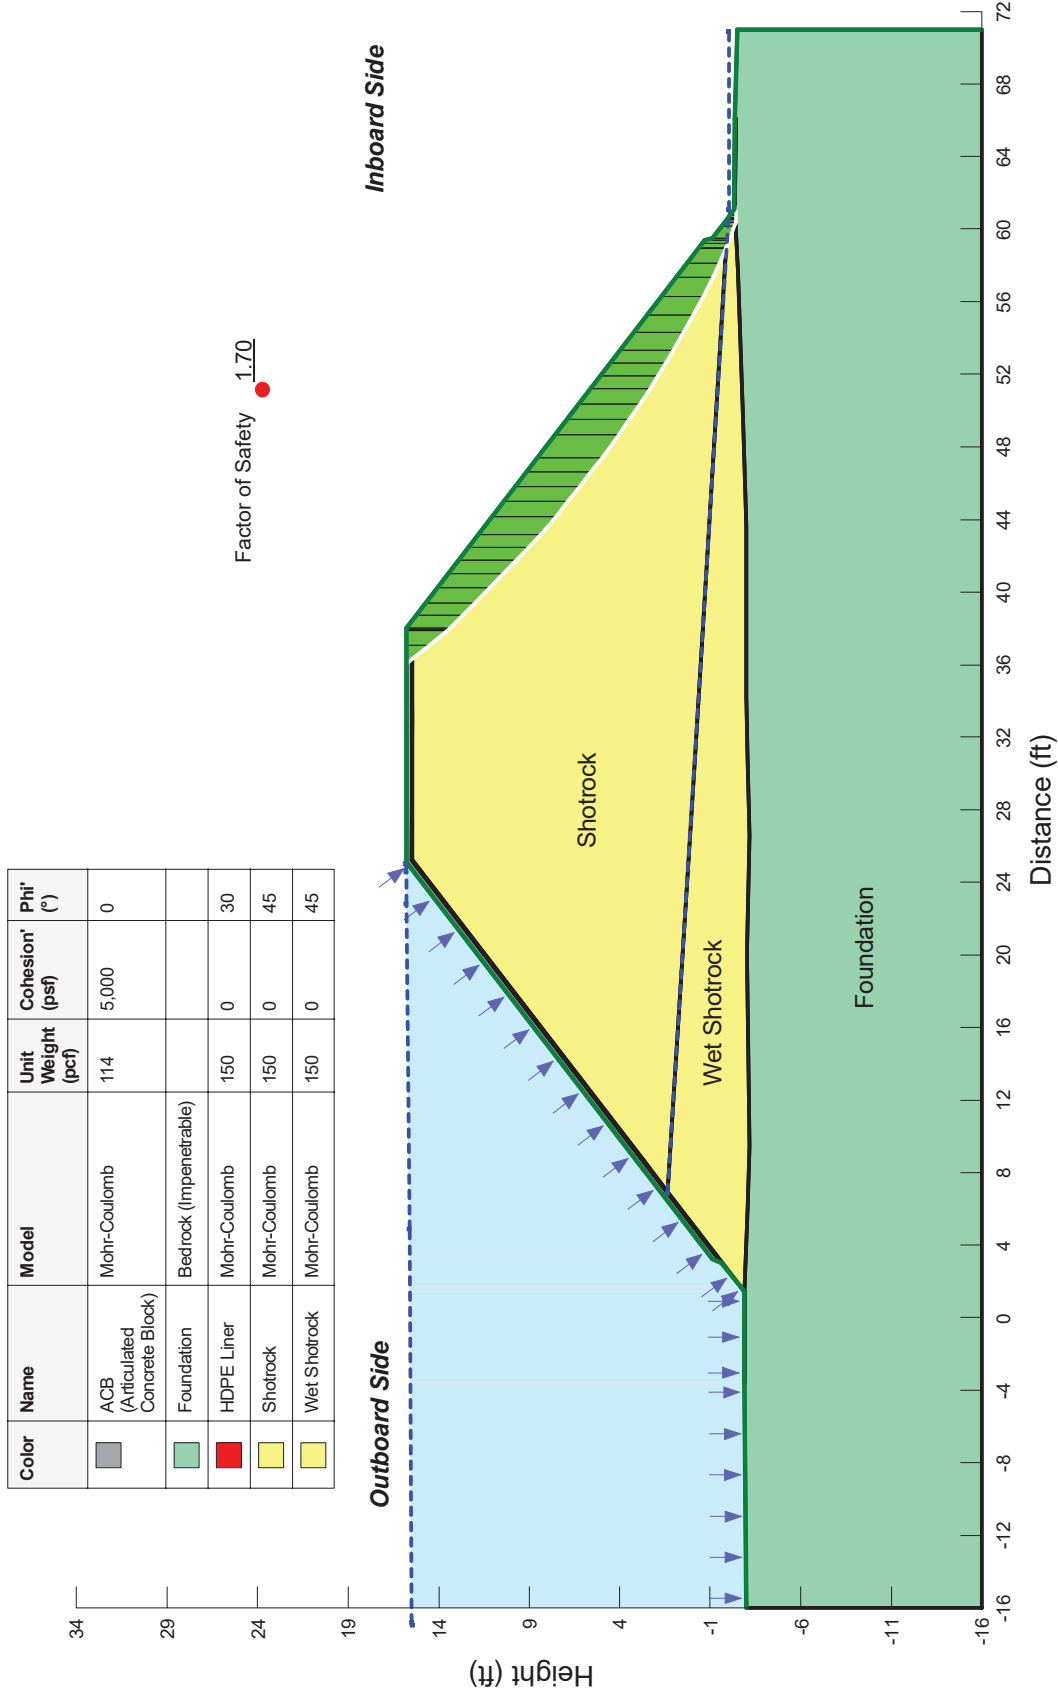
Overflow Section (Reinforced); Outboard Slope Failure Result
